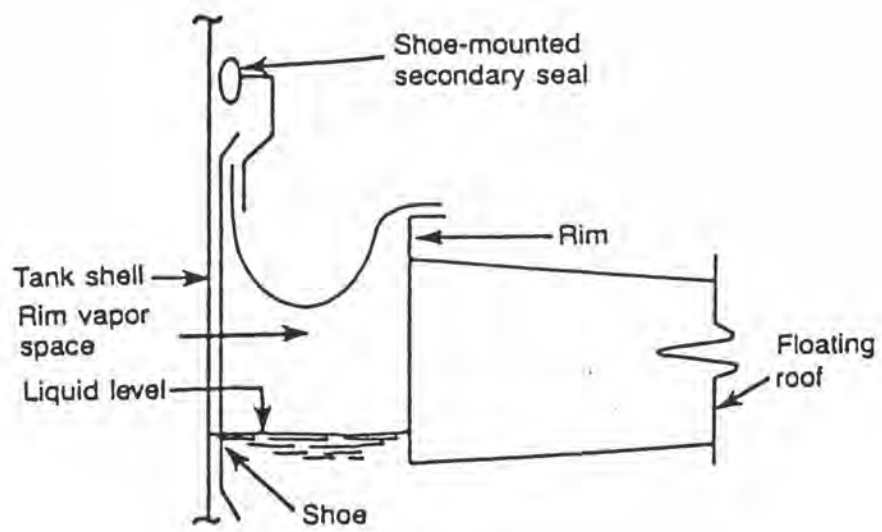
Mechanical-Shoe Primary Seal with Shoe-Mounted Secondary Seal [3]
